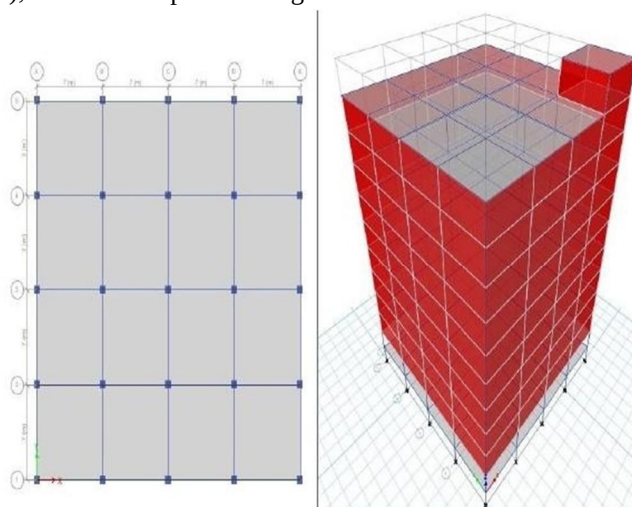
Plan View (Left) and 3D ETABS Model (Right) of Conventional RCC Frame (Model A) – G+10 Storey, 5×5 Bay Grid at 7.0 m Spacing
